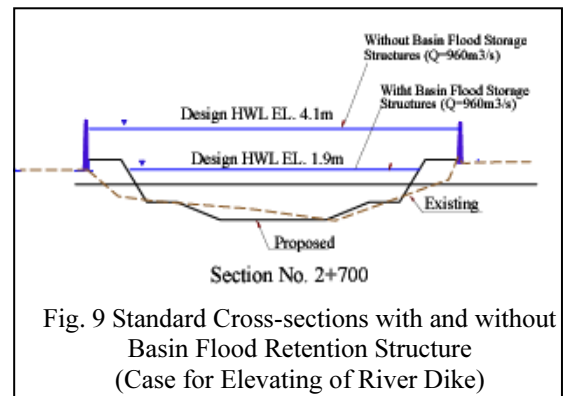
Standard Cross-sections with and without Basin Flood Retention Structure (Case for Elevating of River Dike)
